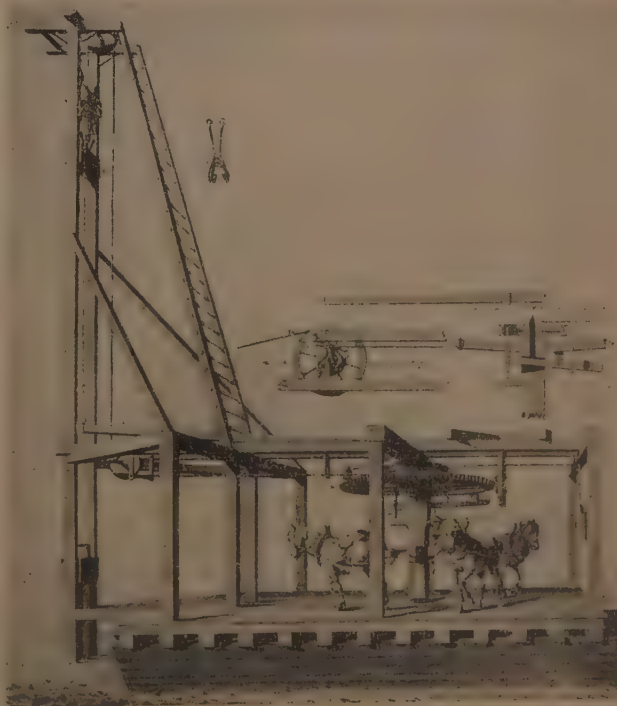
A perspective view of pile driver used at old Westminster Bridge
